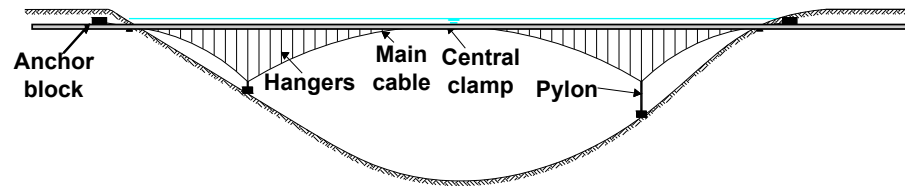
Longitudinal view of the Immersed Inversed Suspension Bridge.;
